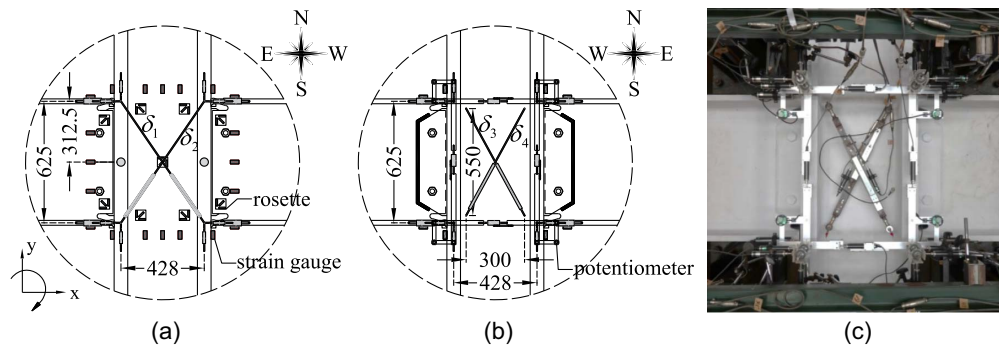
Overview of the instrumentation plan at the panel zone region (unit: mm).
